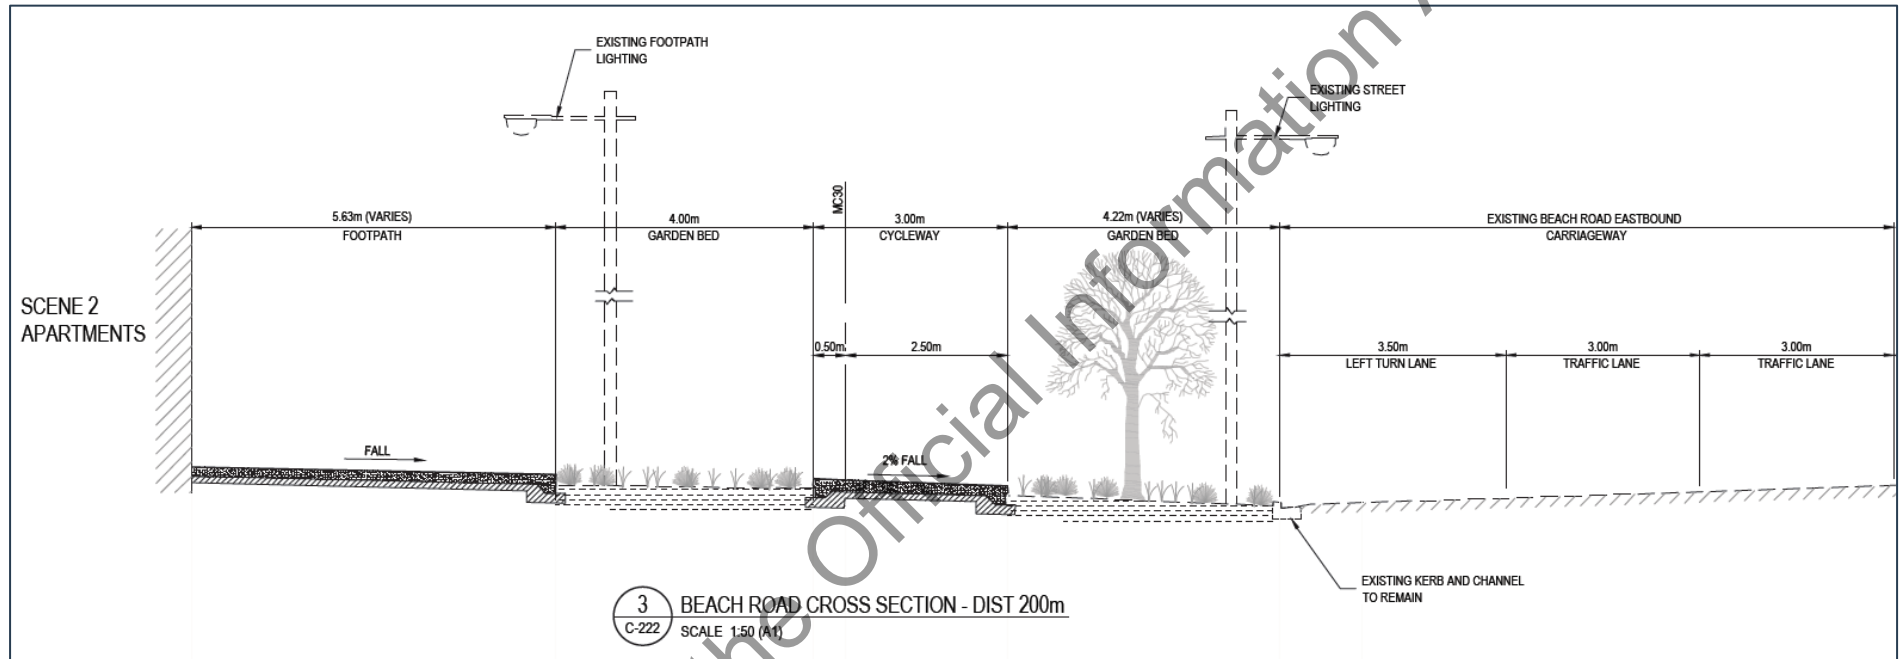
Typical cross section proposed for the Stage 2 construction of the Beach Road Cycleway
